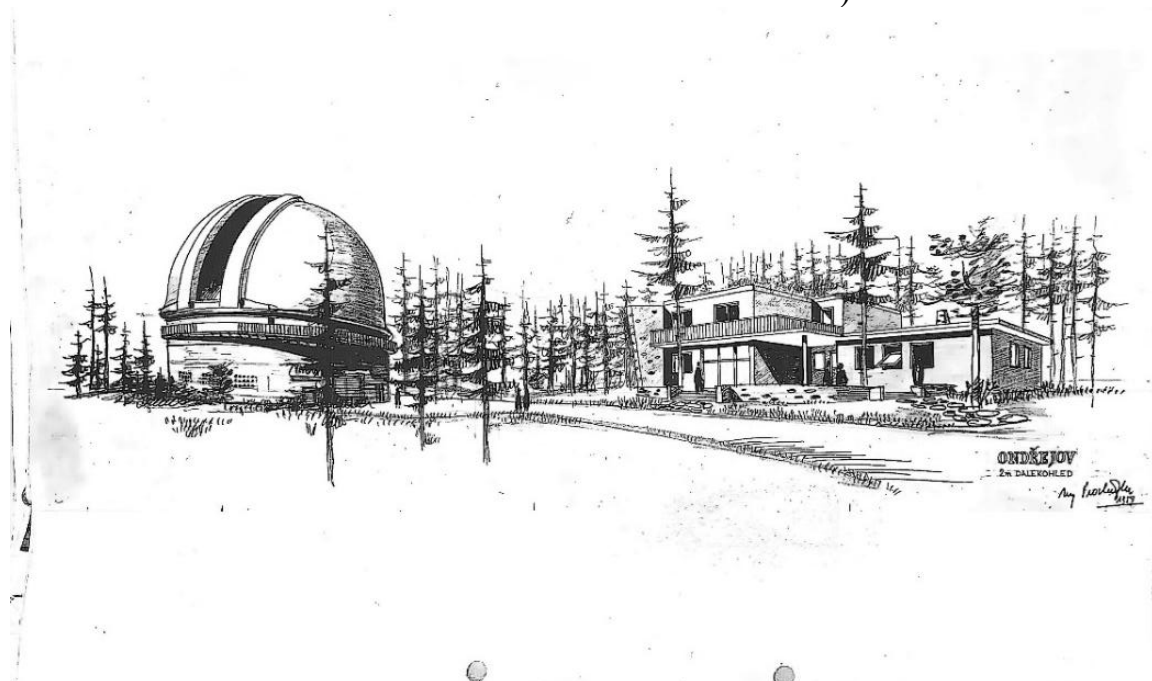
Drawing of the telescope building, service building, and their surroundings (Source: MIA CAS).
